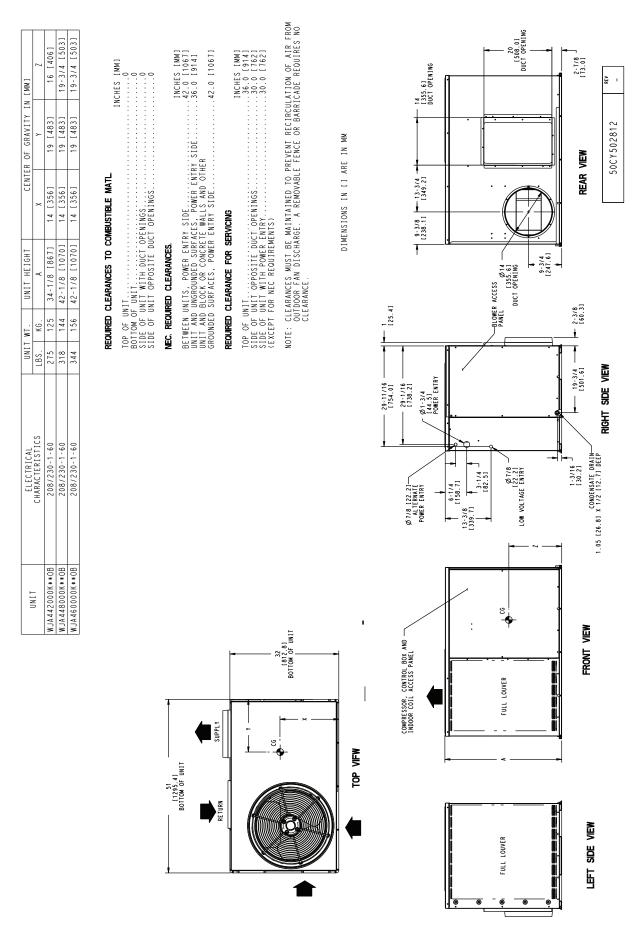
Unit Base Dimensions, WJA4 042-060
